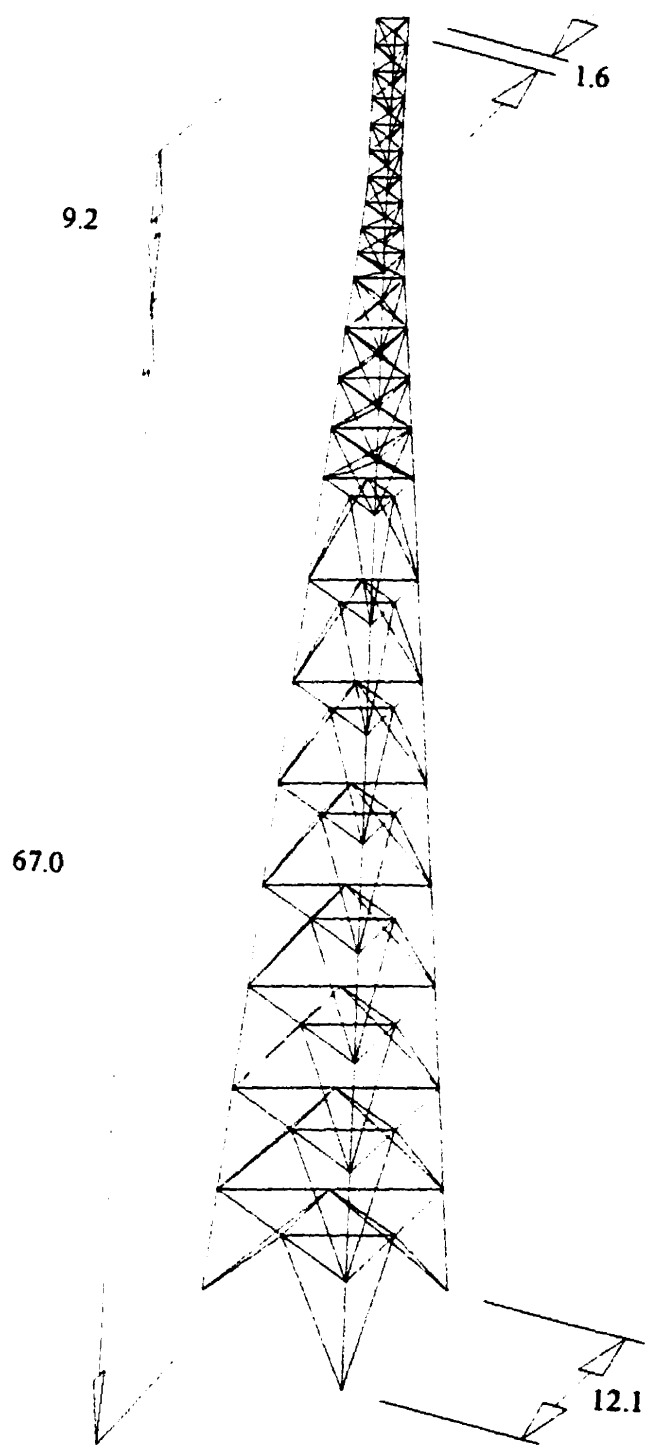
Layout of tower TC5 (dimensions are in m)
